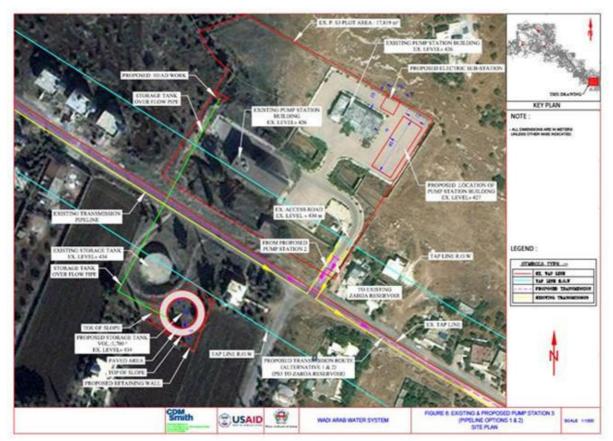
Existing & Proposed Pump Station 3 (Pipeline Options 1 & 2) Site Plan
